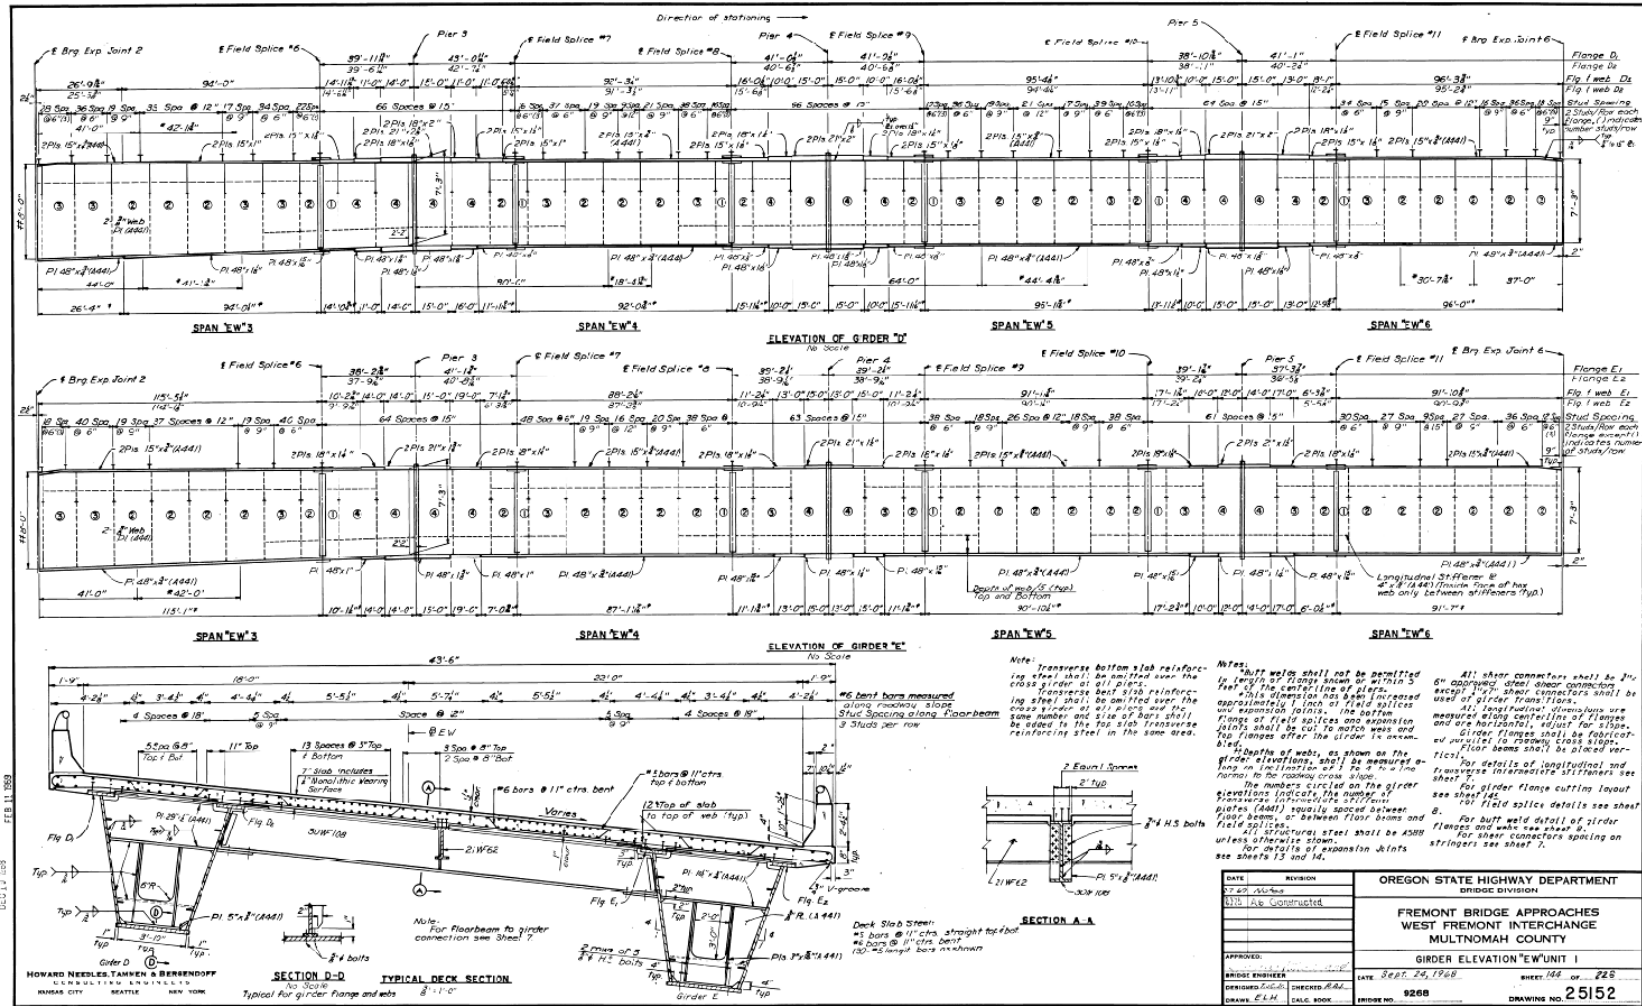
Structural details of EW Unit 1 Bridge superstructure 09268W
